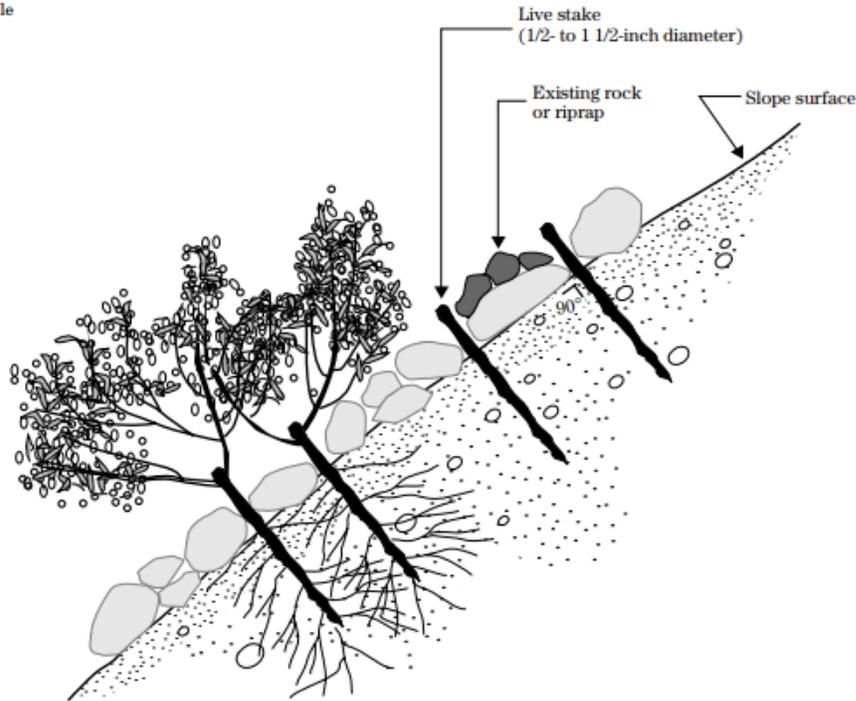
C: Joint planting details. Source: NRCS (1996).
